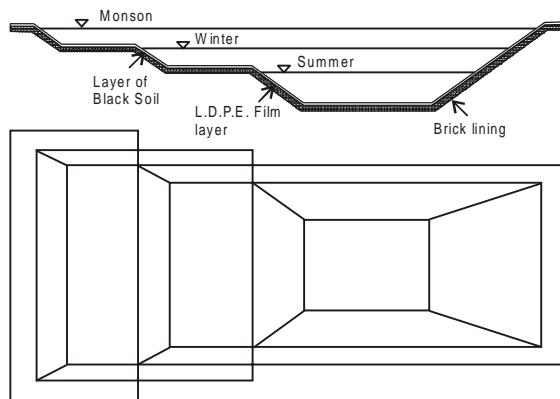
Water harvesting by means of brick and plastic lined ponds.
